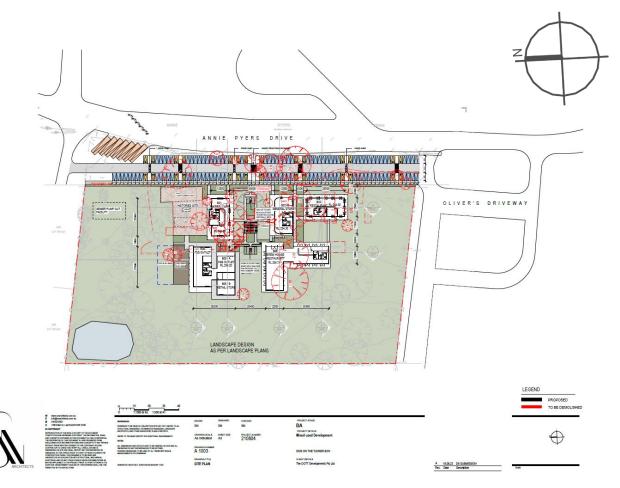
Development Plan REV A 18/08/2023 (SN Architects)
